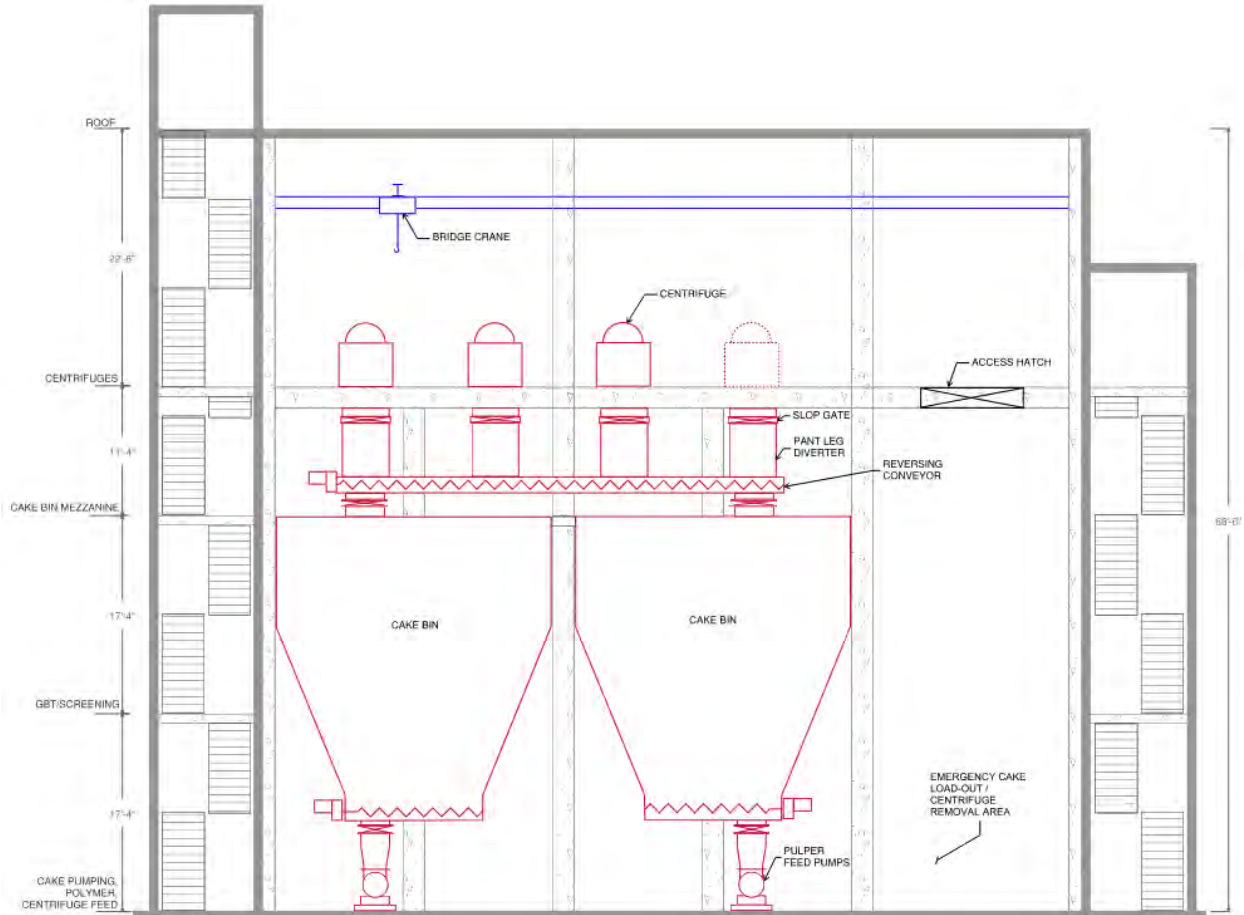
New Thickening/Screening/Dewatering Facility Section 1
